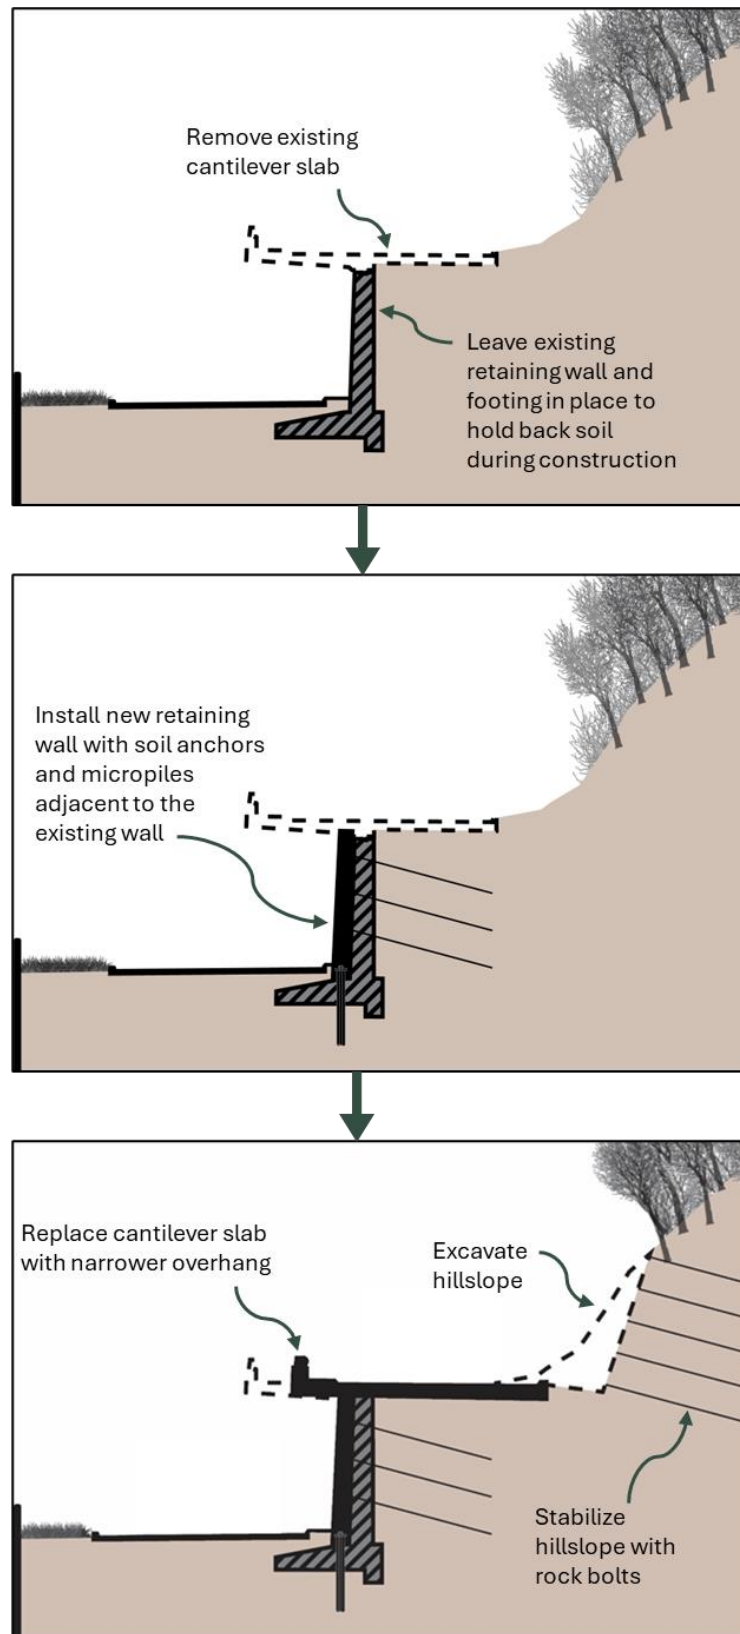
Conceptual Schematic of the Proposed Cantilever Structure Replacement
